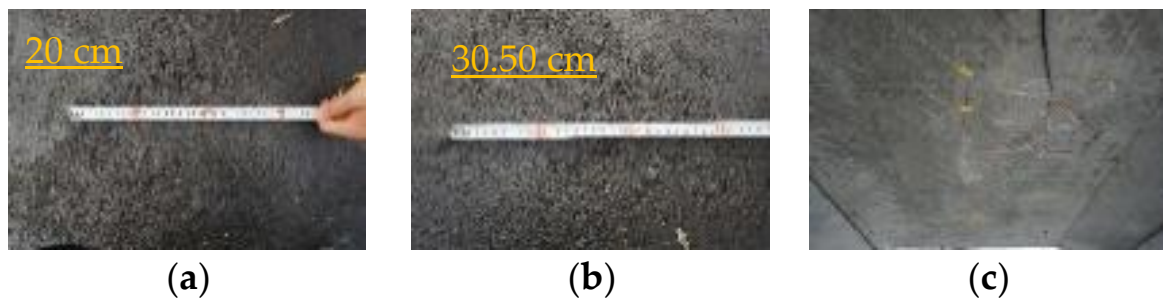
Dimensions of the hole of mid-chamber (PCG). (a) Dimensions of the hole of the top surface (longitudinal direction). (b) Dimensions of the hole of the top surface (transverse direction). (c) No damage.
